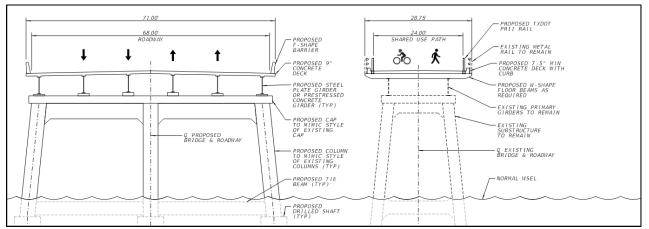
Alternative 4 Typical Section (Approach Spans – Not Showing Substructure Retrofits)
